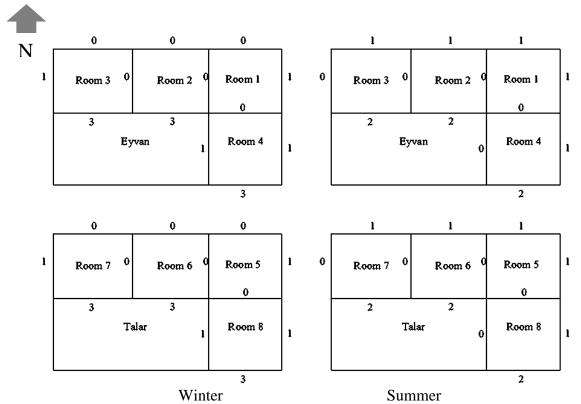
Justified numbers for solar gain in each closed space on the ground floor and first floor plan of a traditional building in Rasht during winter and summer
